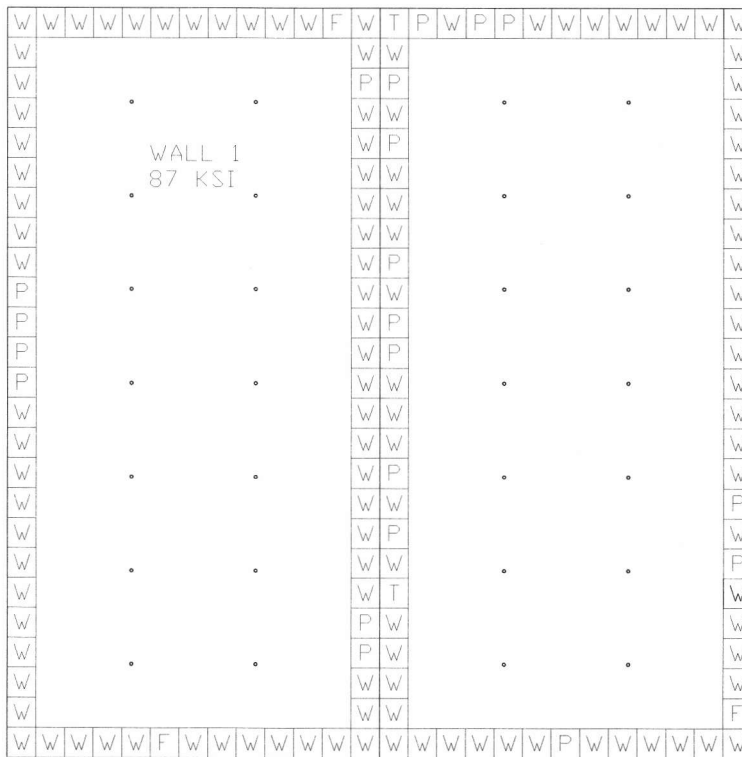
Sheathing nail failure modes for Wall 1, $f_{yb}=87$ ksi
